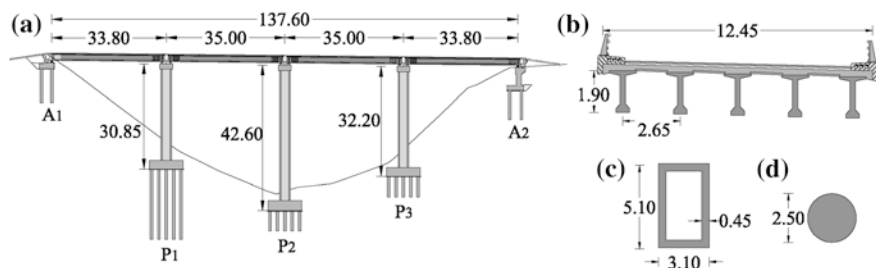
a Longitudinal section of the “reference” bridge, b cross-section of the deck, c cross-section of the piers of the “reference” bridge and d cross-section of the piers of the ductile alteration of the “reference” bridge
